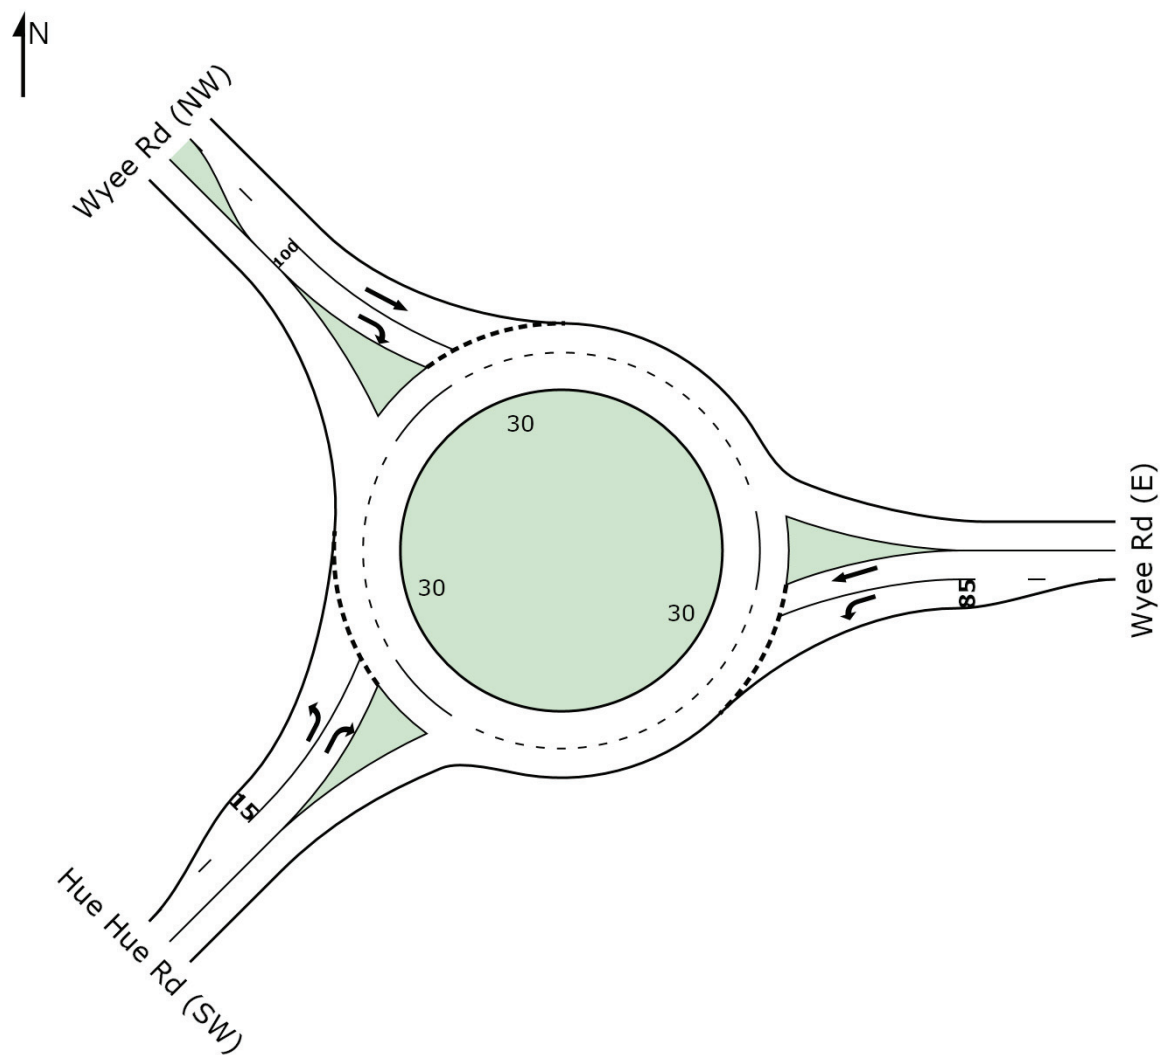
Proposed layout for the Hue Hue Road/Wyee Road intersection
